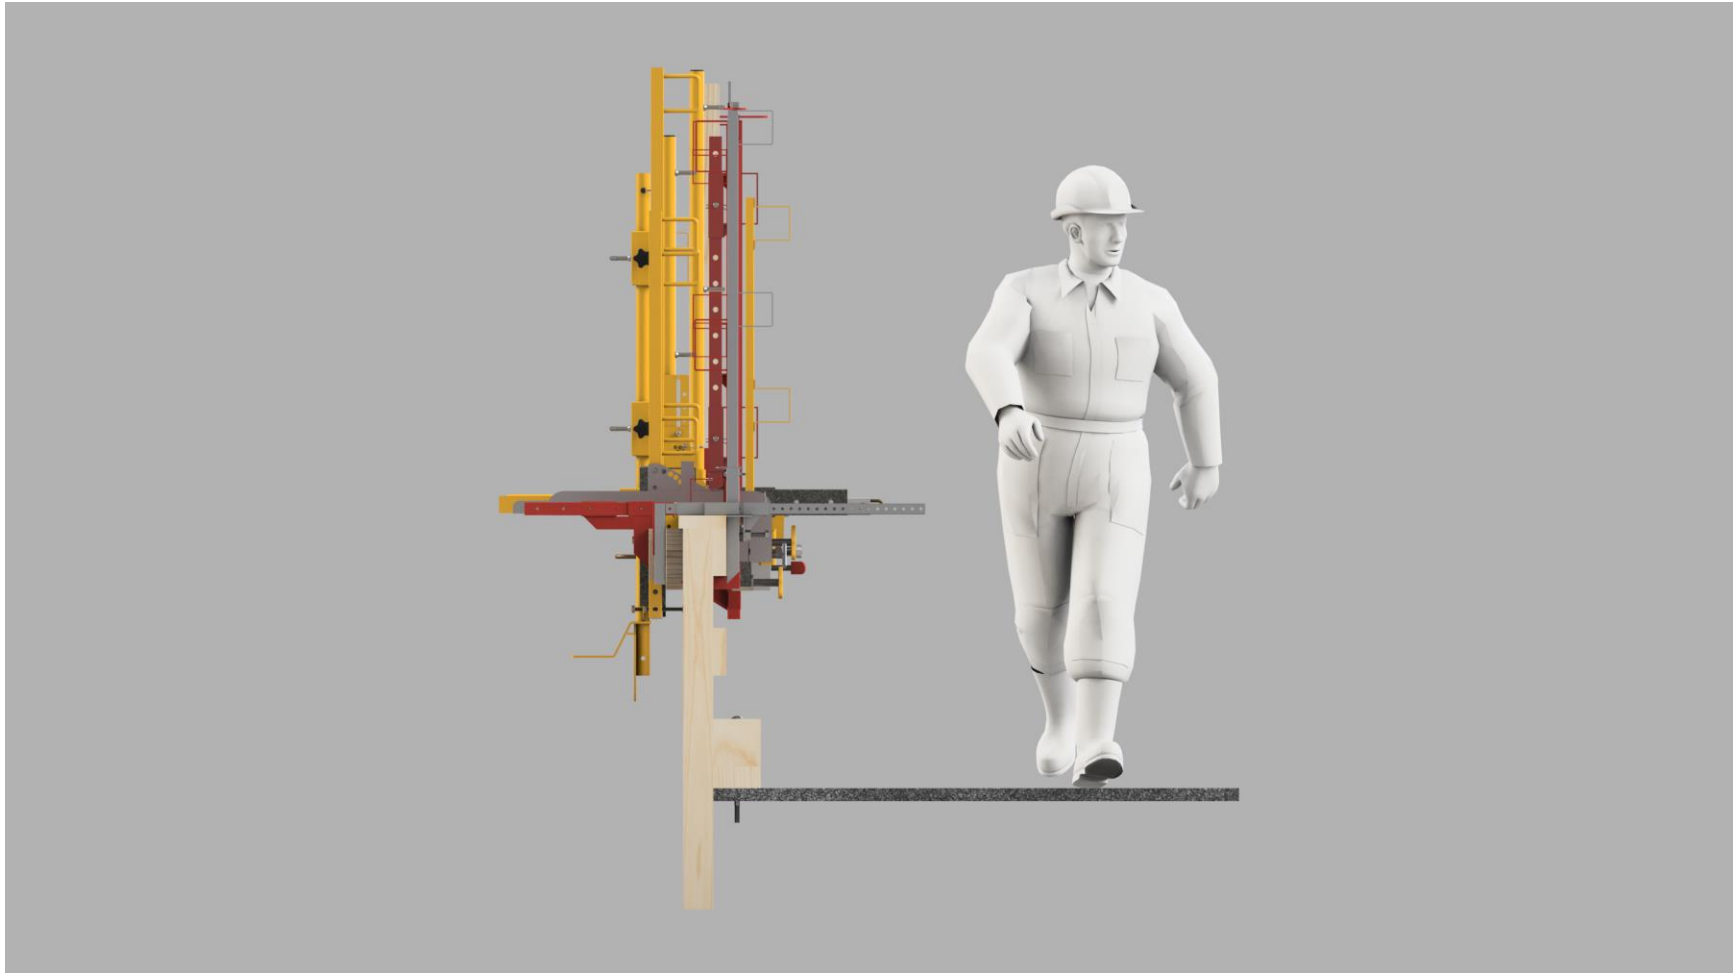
Guardrail Type 22, guardrail fit; view from the south
